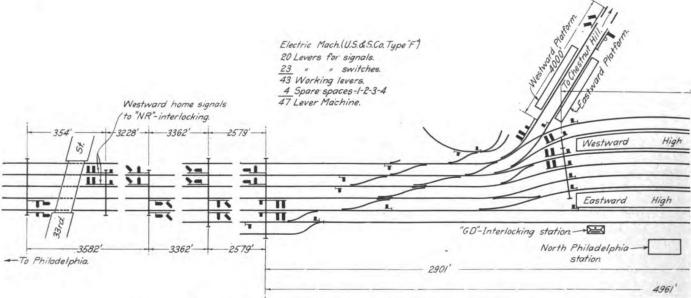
Track Plan and Signal Location at North Philadelphia (Continued below).
